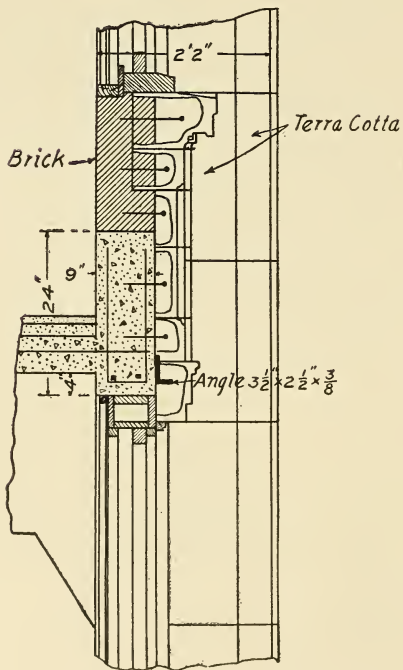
Wall Beams, Buck Building, Philadelphia, Pa.
